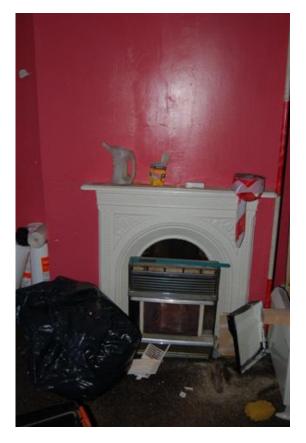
Bldg C, Block C3; Rm CF14 fireplace detail.
